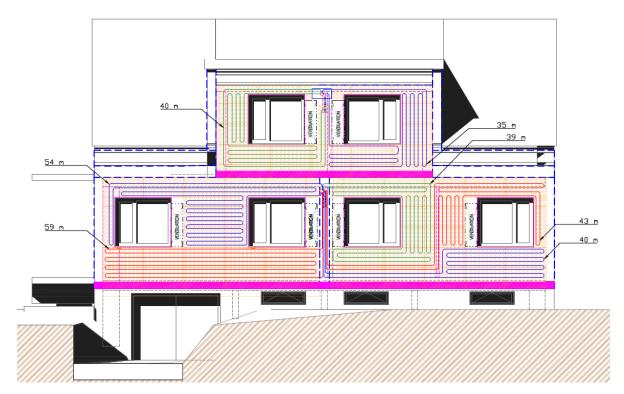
South façade of the Kasava demo as example with heating loop meanders that are located between old façade and new insulation. To better distinguish the loops, they have various colors. The pink bars indicate the space which is required for the L-profiles. The numbers show the length of each loop.
